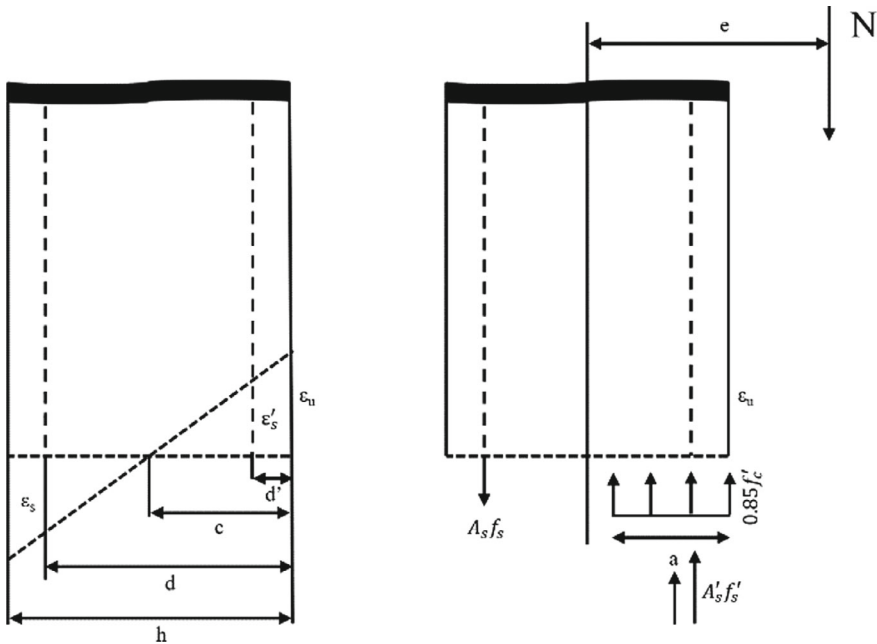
Deformation, stresses and forces in reinforced concrete column under uniaxial bending effect
